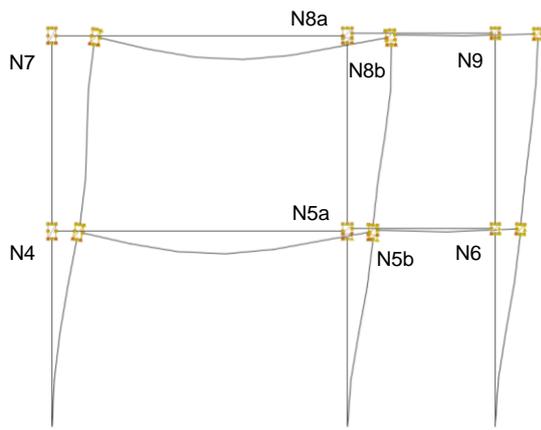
Deformed shape of steel frame and joints’ numbering.
